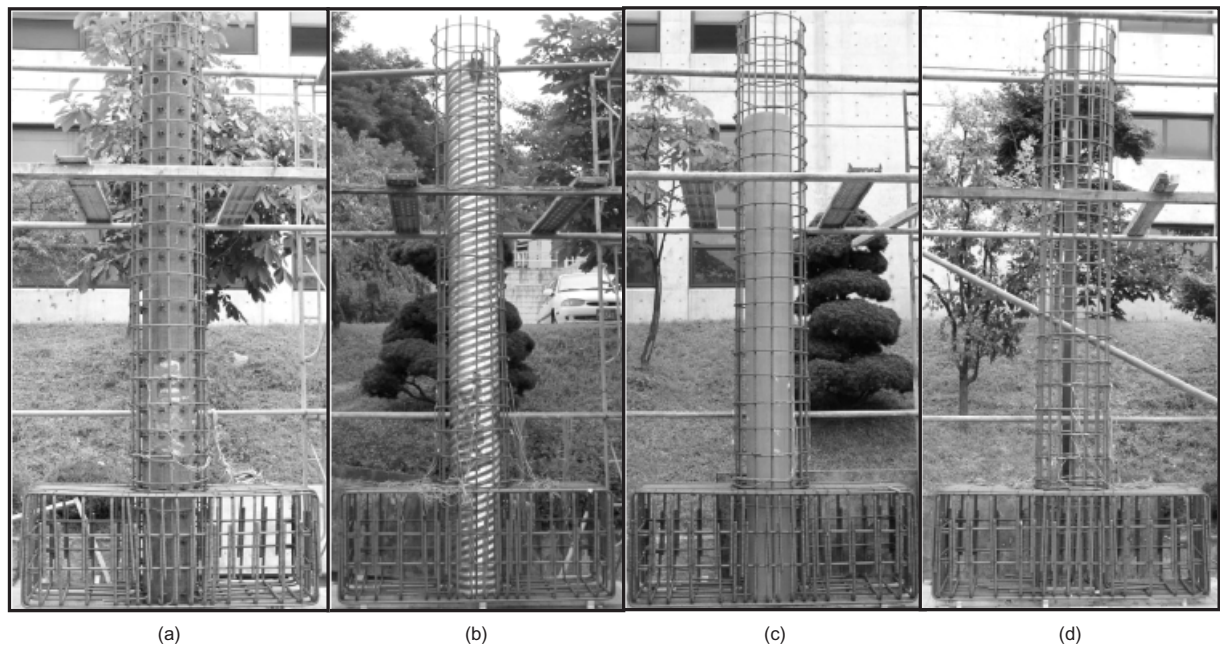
Column specimens under construction: (a) ICH RC-ST column; (b) ICH RC-CT column; (c) ICH RC-PVC column; (d) solid RC column
